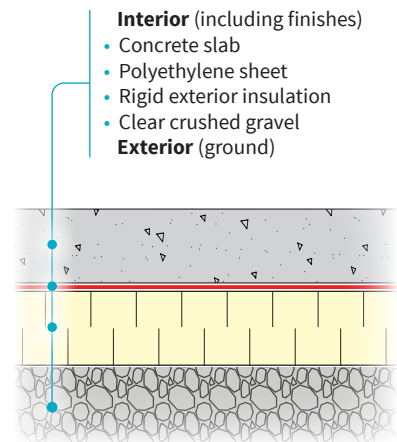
Typical exterior-insulated floor slab assembly components.
